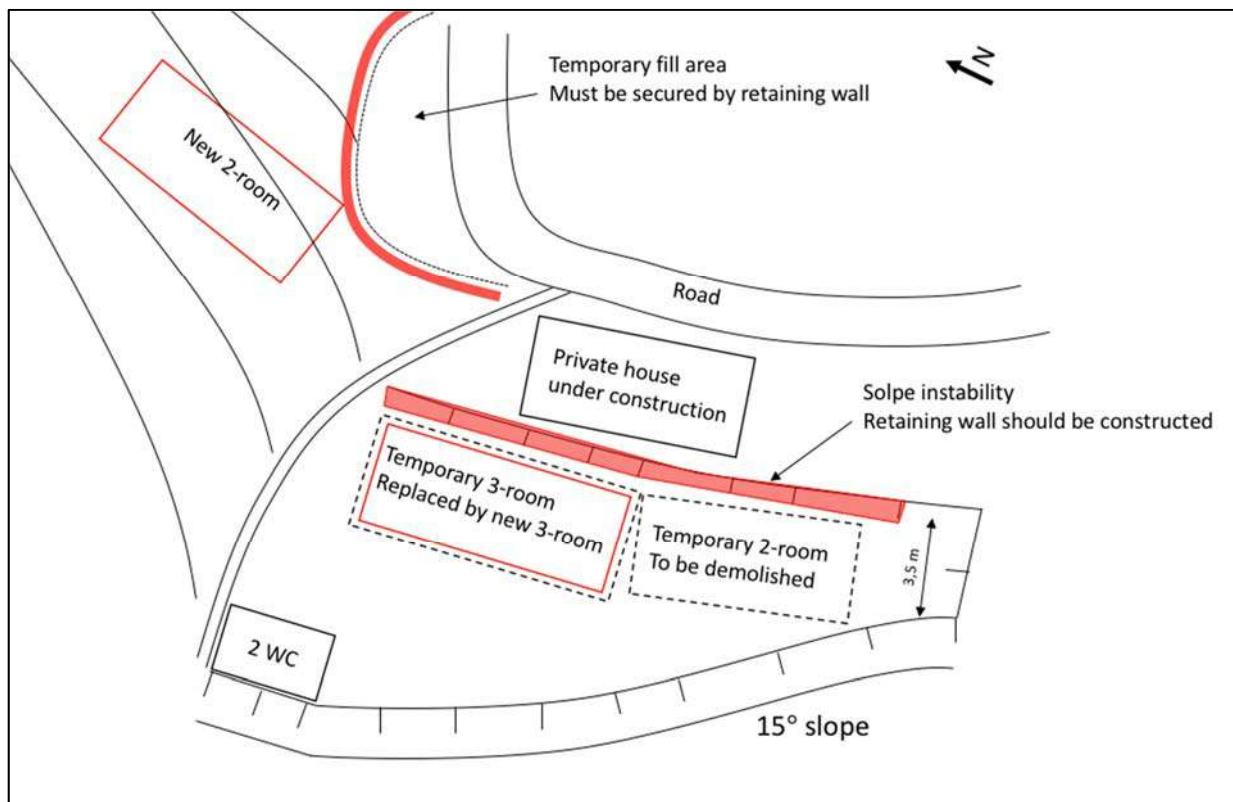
Plan view – Lingba school. Two retaining walls must be constructed; in front of the fill area and at the backwall.
